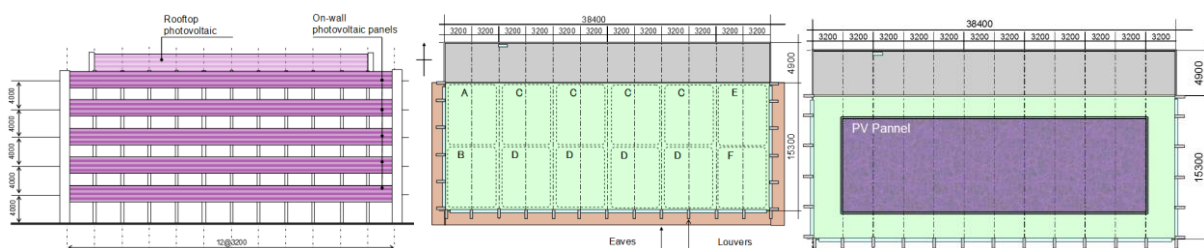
Building front view (left), floor plan (middle) and roof plan (right) of the modelled building
